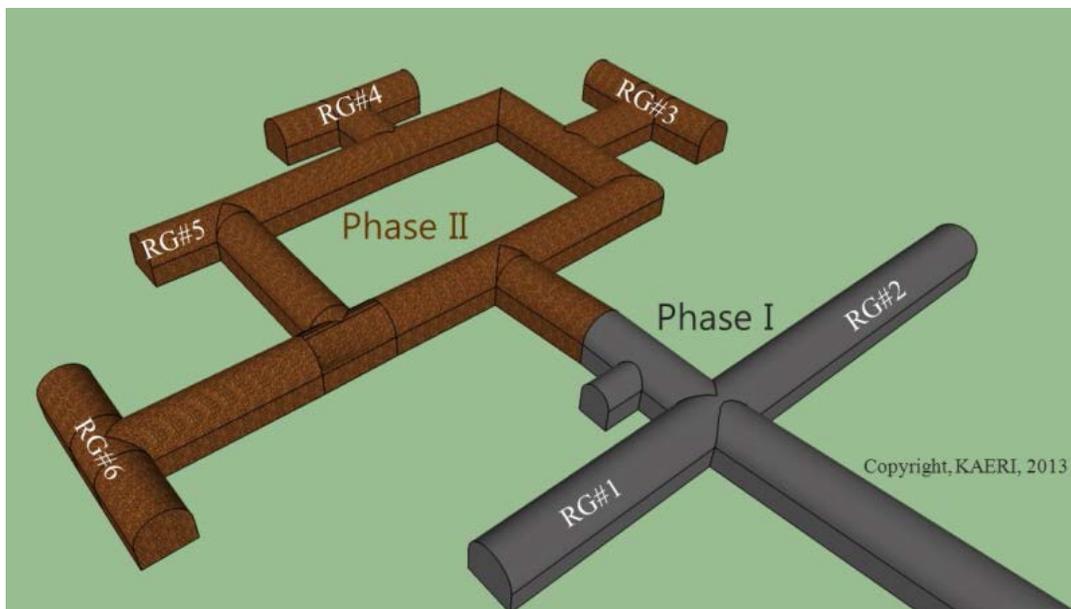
Layout for tunnel extension of KURT (Wang et al., 2014).
